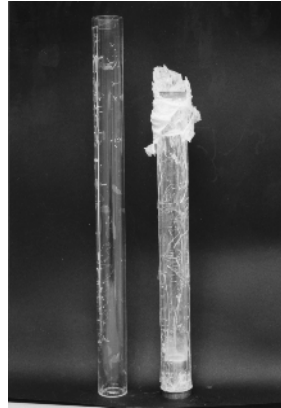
Rigidly clamped column specimen next to untested specimen.
